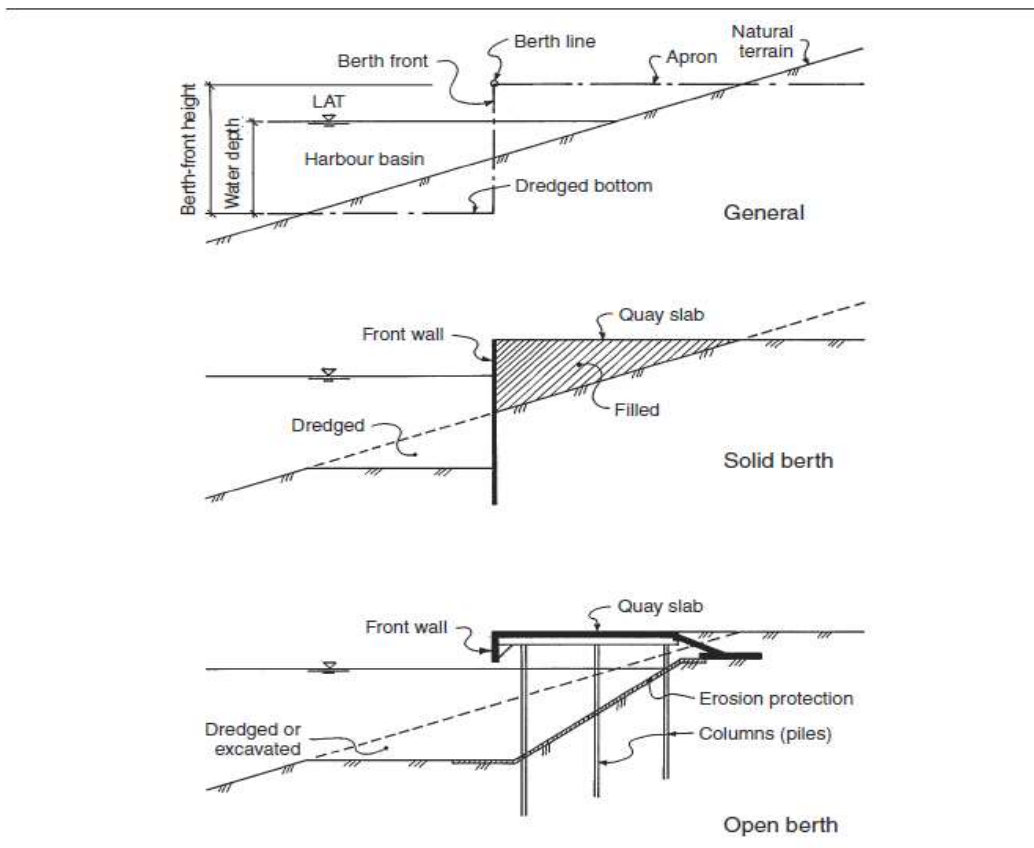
Indicating Solid & Open berthing structures (Source: Thoresen, 2014)
